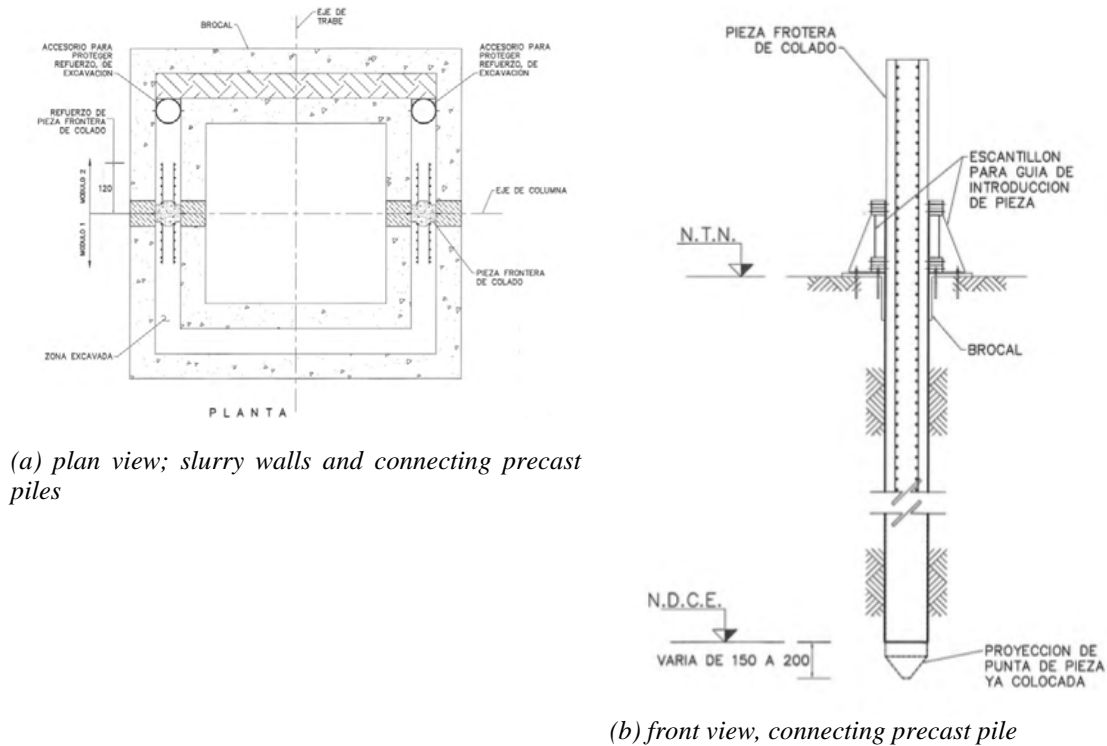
, Slurry wall bearing cell details, after ICA (2010)
